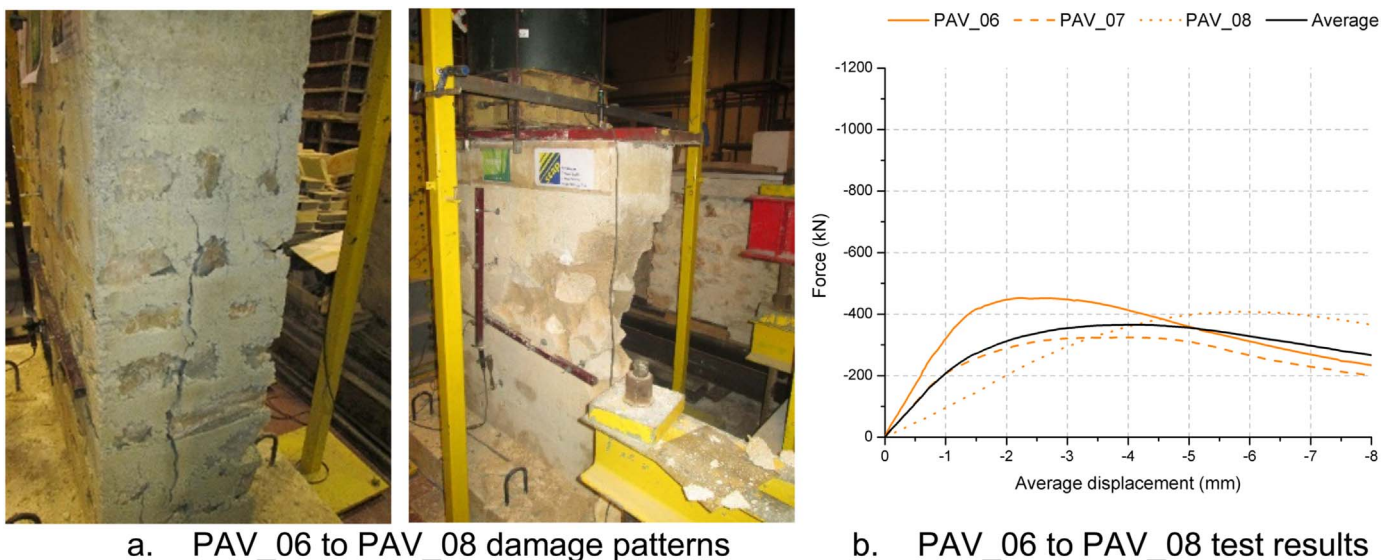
Wall compression tests (non-confined walls – 60 days old).
